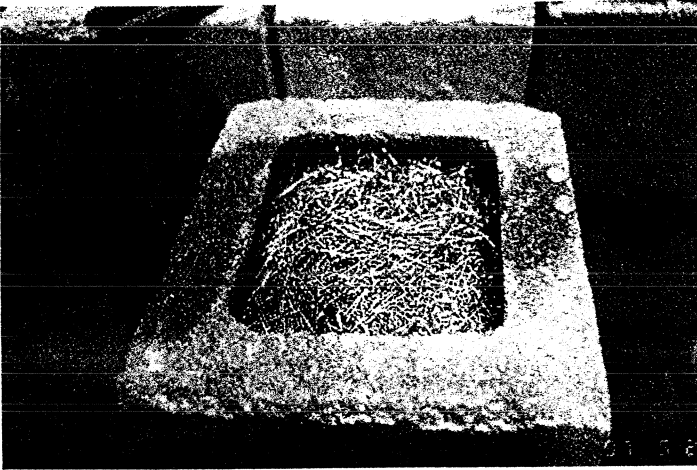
Masonry prism filled with steel fibers prior to grout injection.
